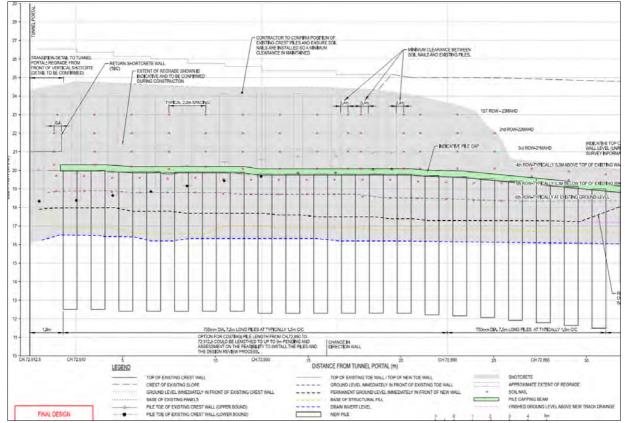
ELEVATION SHOWING RETAINING WORKS ON EAST APPROACH AT DOWN END PORTAL. (SOURCE: AURECON/VLINE)
